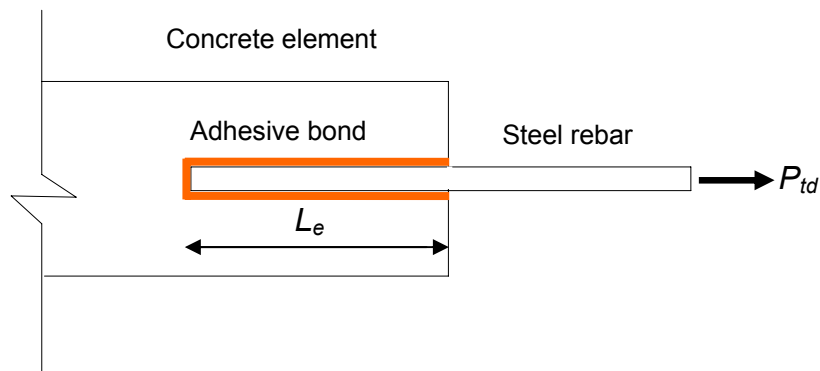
Schematic drawing of adhesively-bonded steel rebar in concrete element
